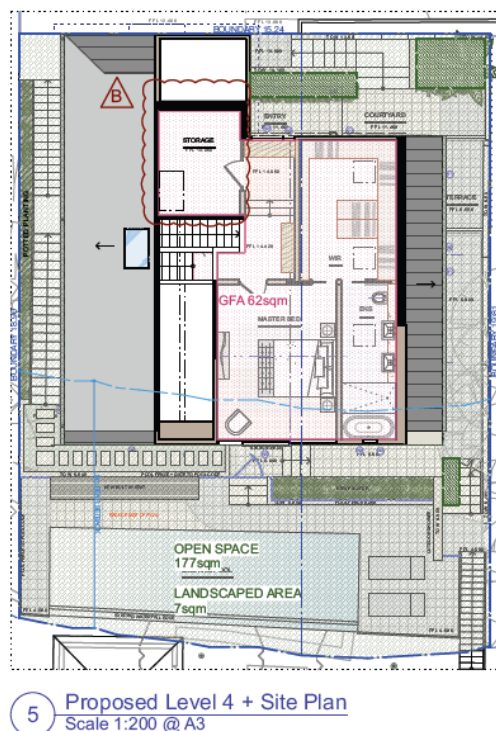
Image showing how L4 Floor Space is calculated (including storage) for the Issue B plan (amended plan) at 62sqm, which includes a reduced storage area.
